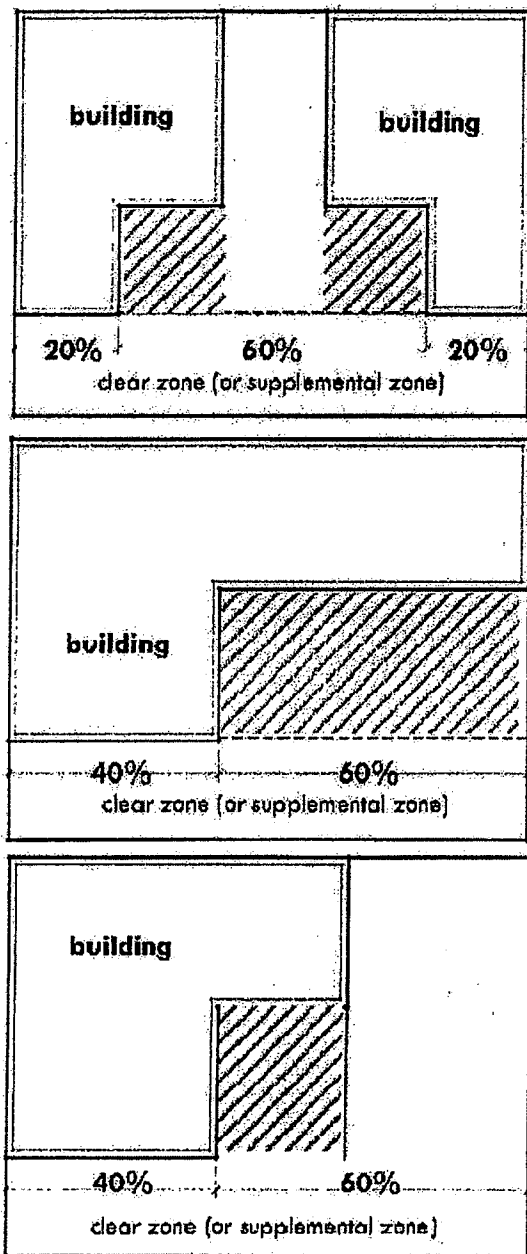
Examples of building placement on urban roadways. Parking is generally not permitted in the hatched area between the building facade and the sidewalk, except for shallow lots, as described in paragraph D.
